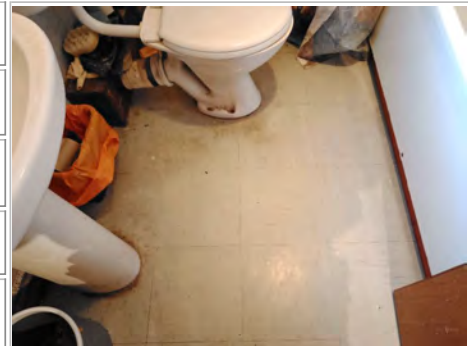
Vinyl floor tiles (beige) on solid floor
